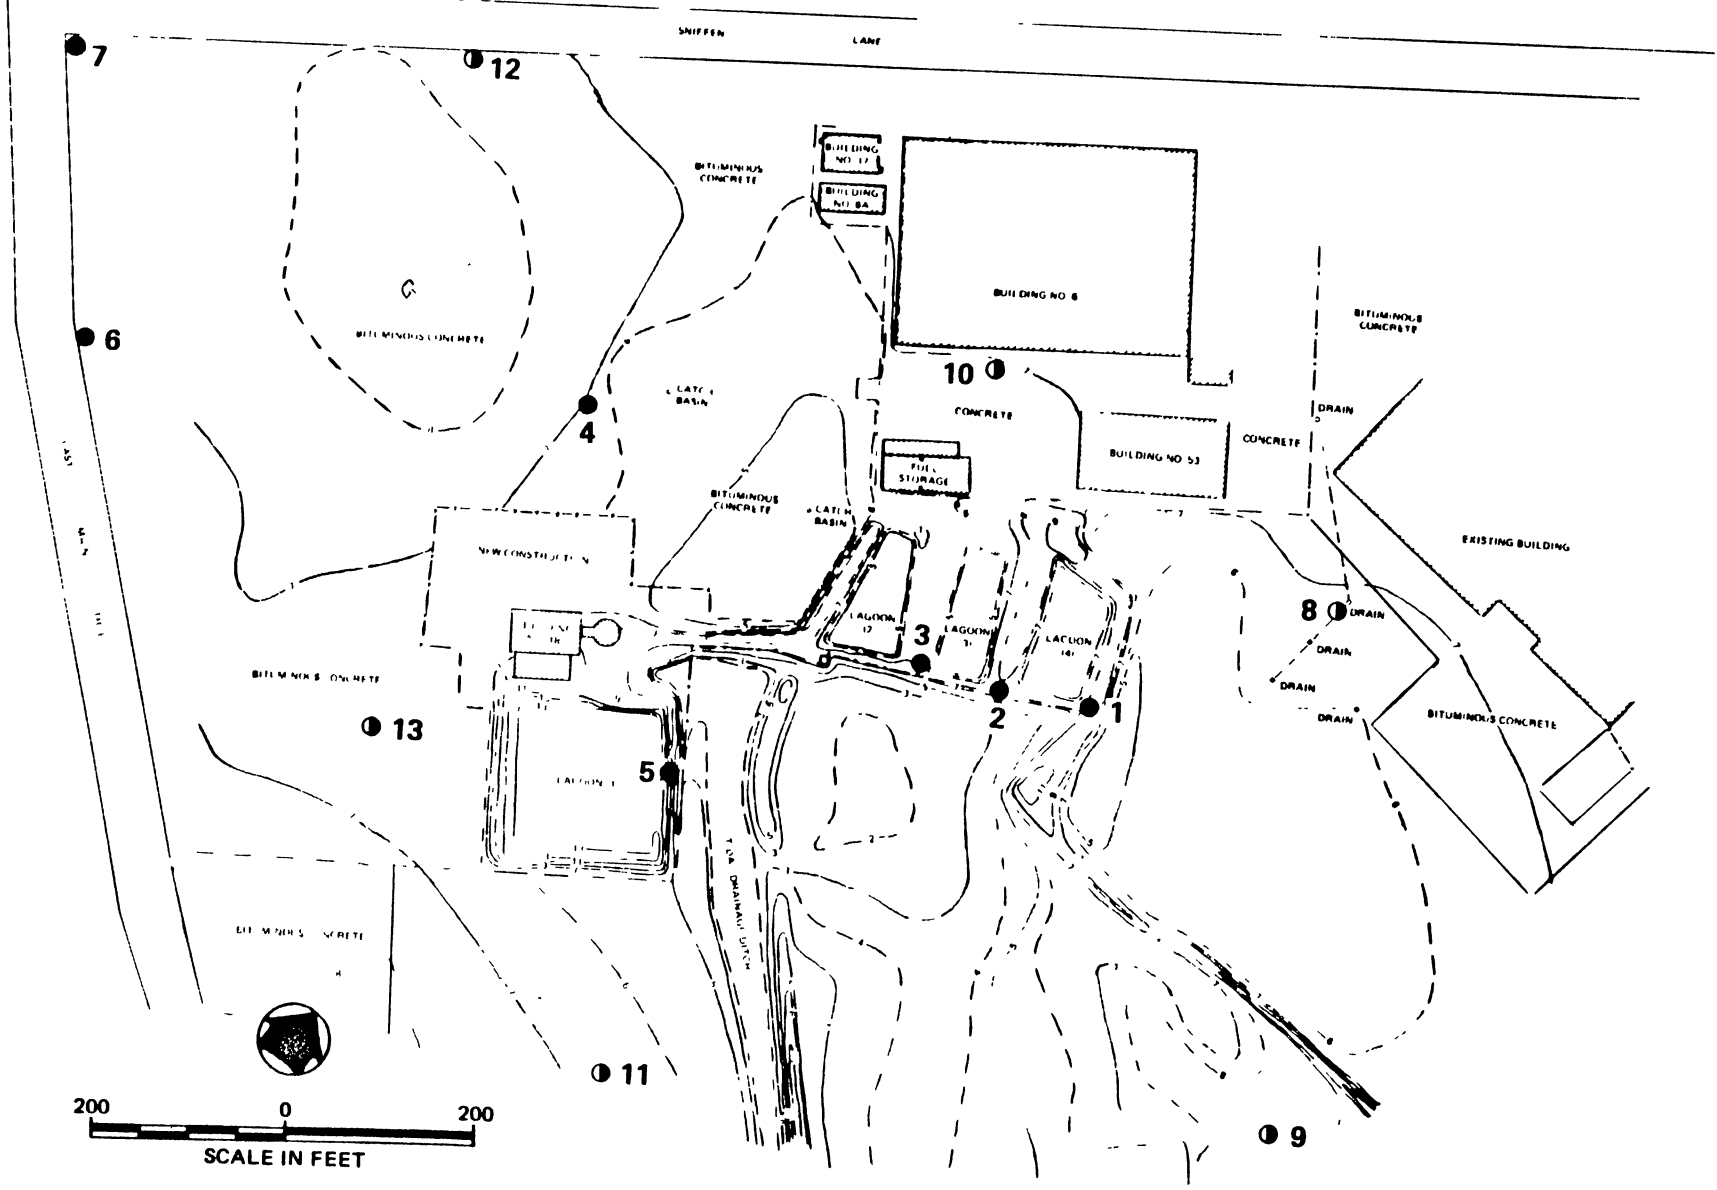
SITE PLAN - AVCO LYCOMING FACILITY
